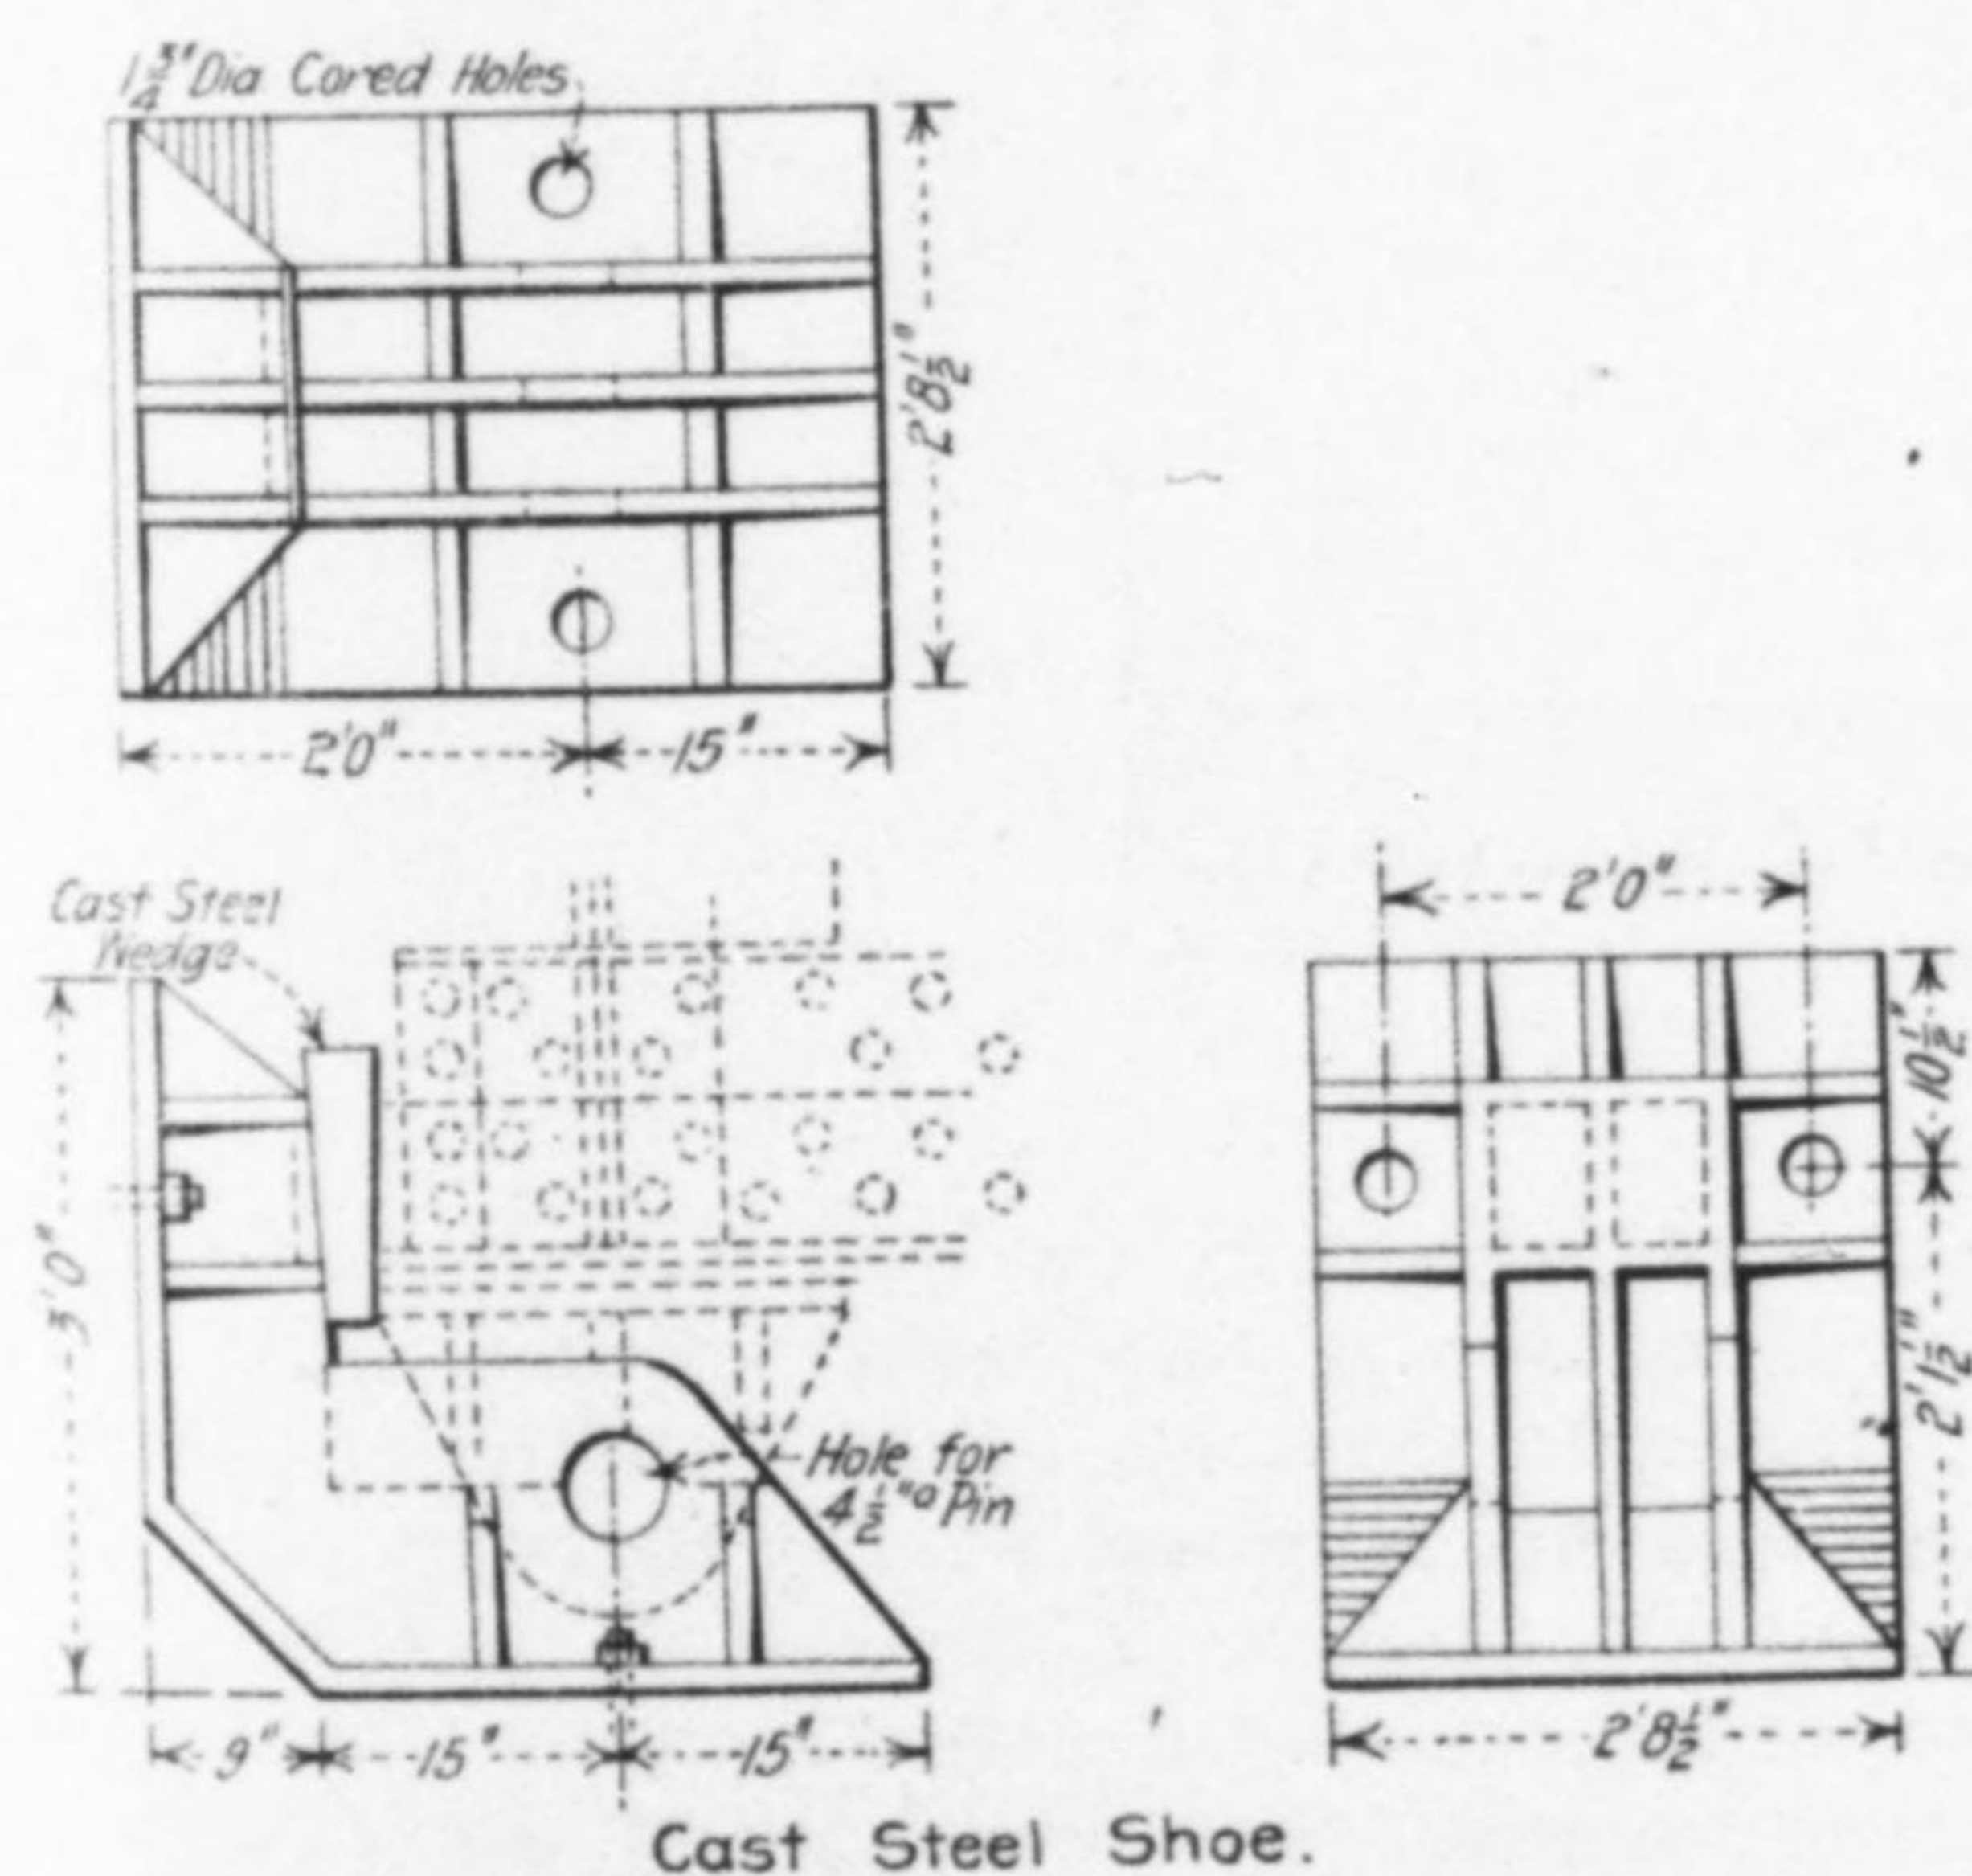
DETAILS OF PIER FOR SUPPORT OF MIDDLE GIRDER SPAN, DALLAS-OAK CLIFF VIADUCT.
